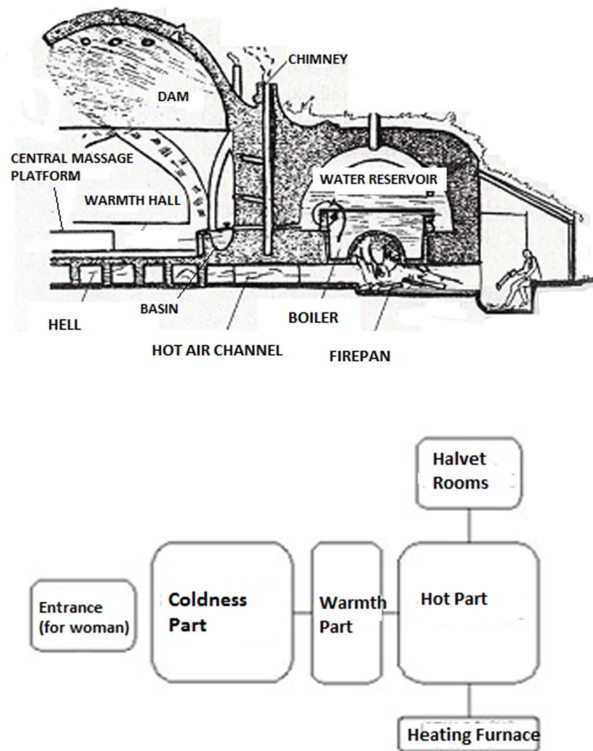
Turkish bath cross-section and plan (Özbek n.d.)
